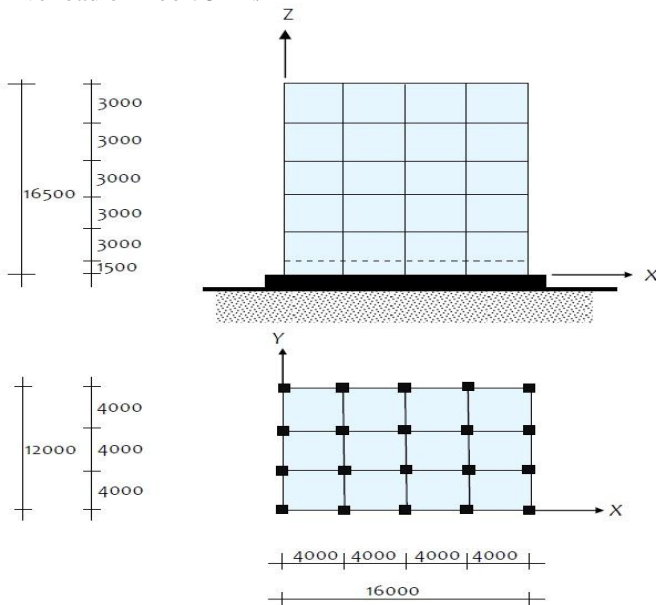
Five-storey Benchmark Building: Elevation and plan of benchmark building showing the structural moment frame grid (All dimensions are in mm)
